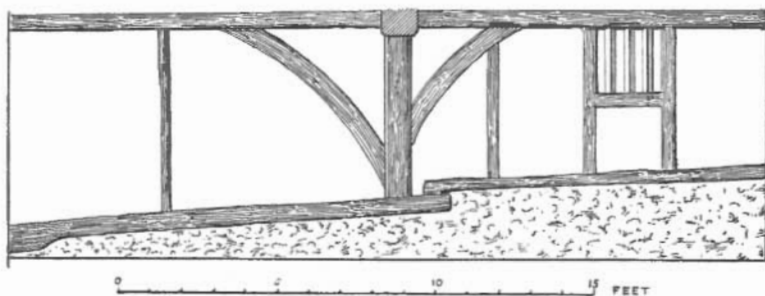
ELEVATION OF EAST WALL OF EAST WING,
